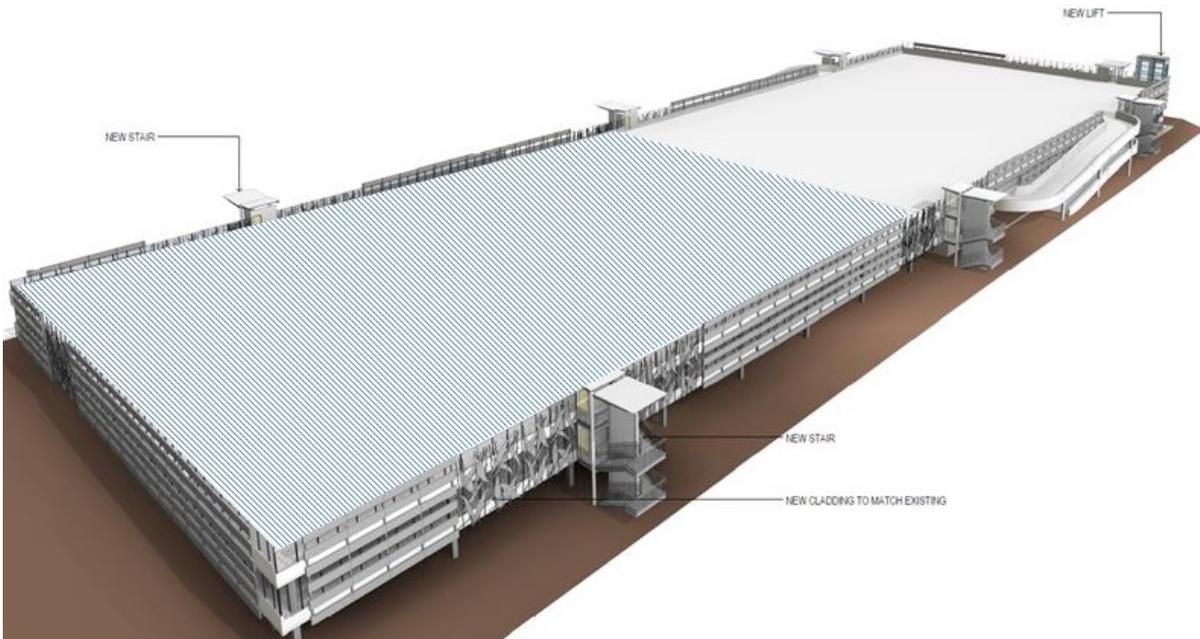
INDICATIVE LAYOUT OF PROPOSAL SITE WITH EXTENDED MULTI-STOREY CAR PARK ON LEFT (SUBJECT TO DETAILED DESIGN)
